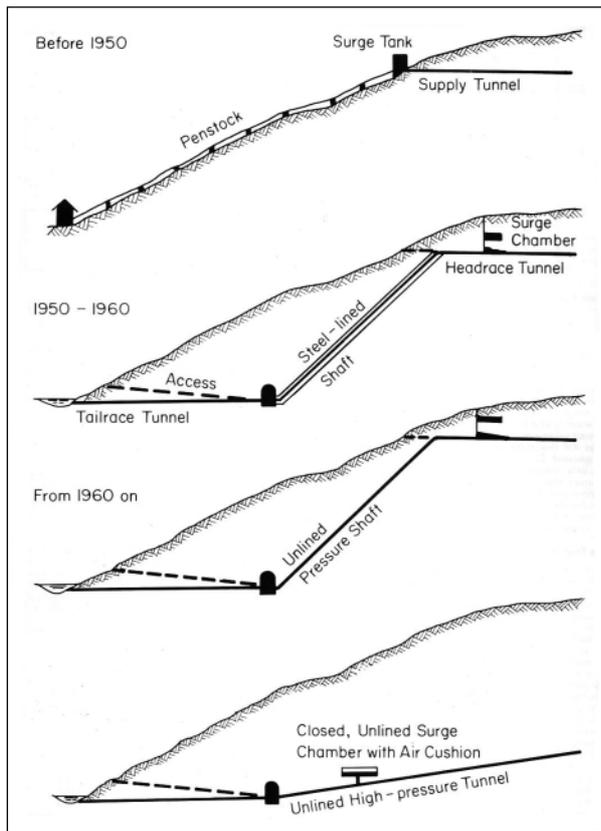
The development of the general layout of hydropower plants in Norway (from Broch 1985)
